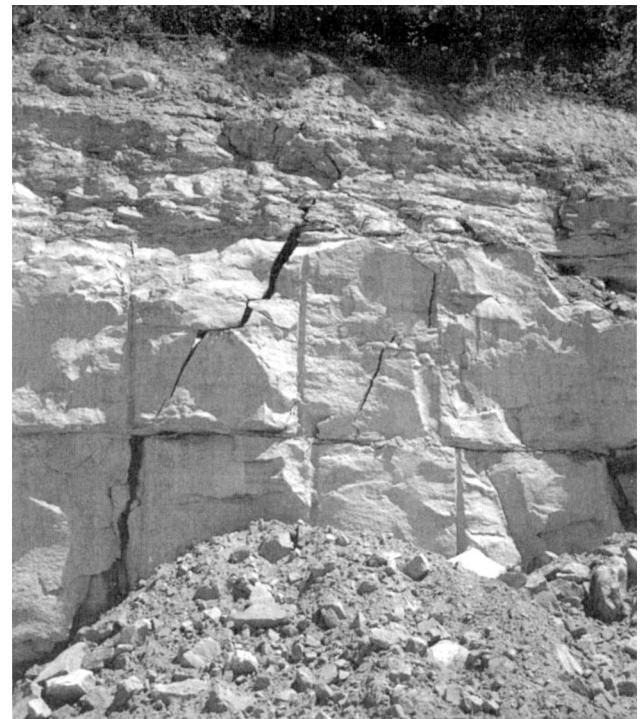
Coal strip mine highwall severely damaged by blasting.
